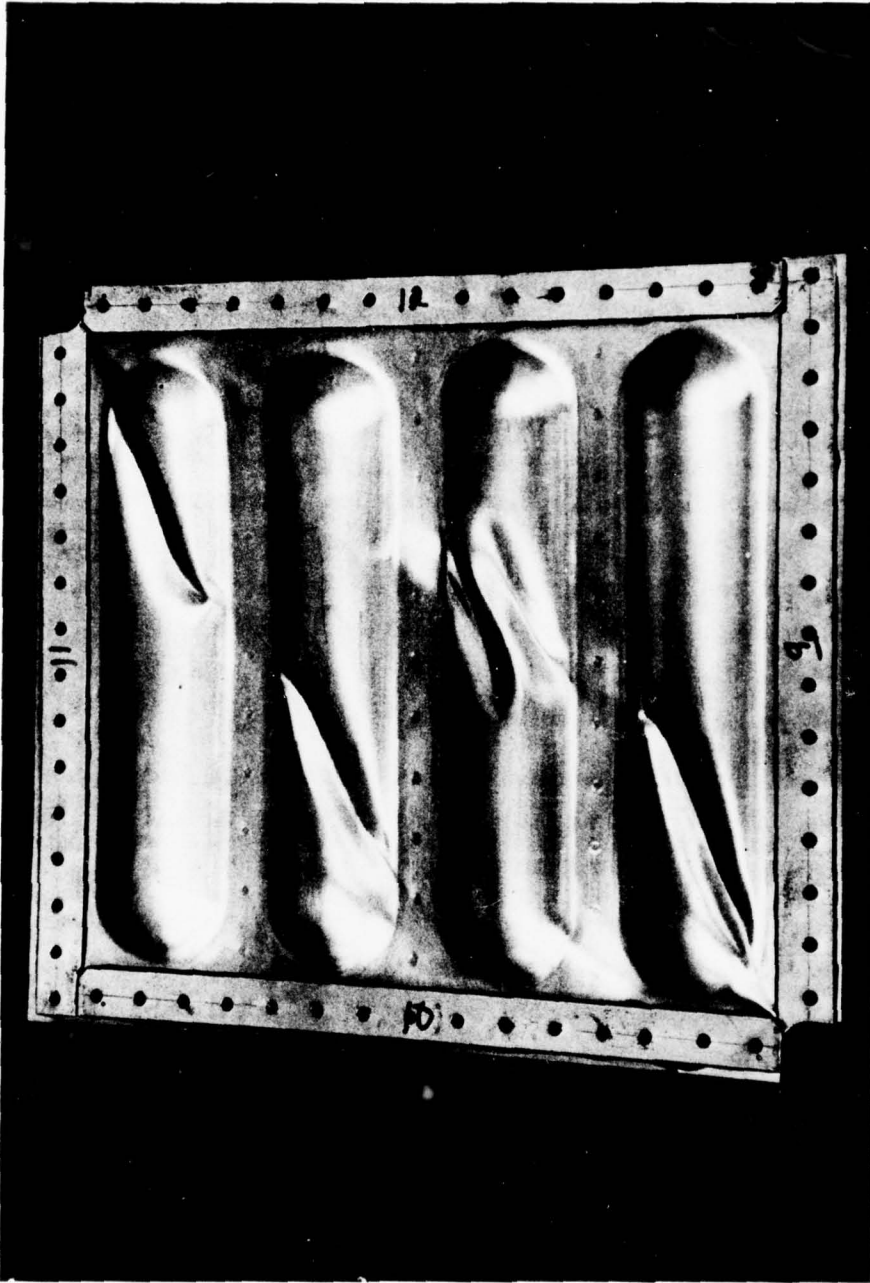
TYPICAL STATIC TEST PANEL STABILITY FAILURE
